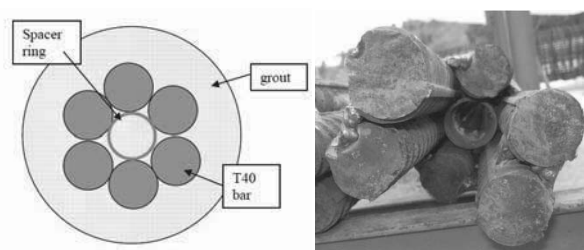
(a) Cross section through pre-drilling hole with assembly of T-bars; (b) Photo of T-bar assembly with spacer ring
